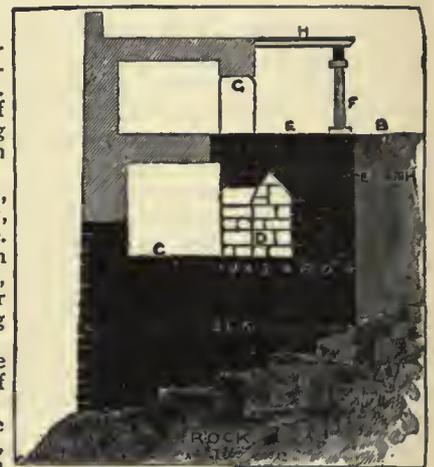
Section through the Outer Wall of the City at 20 in fig. 1.
